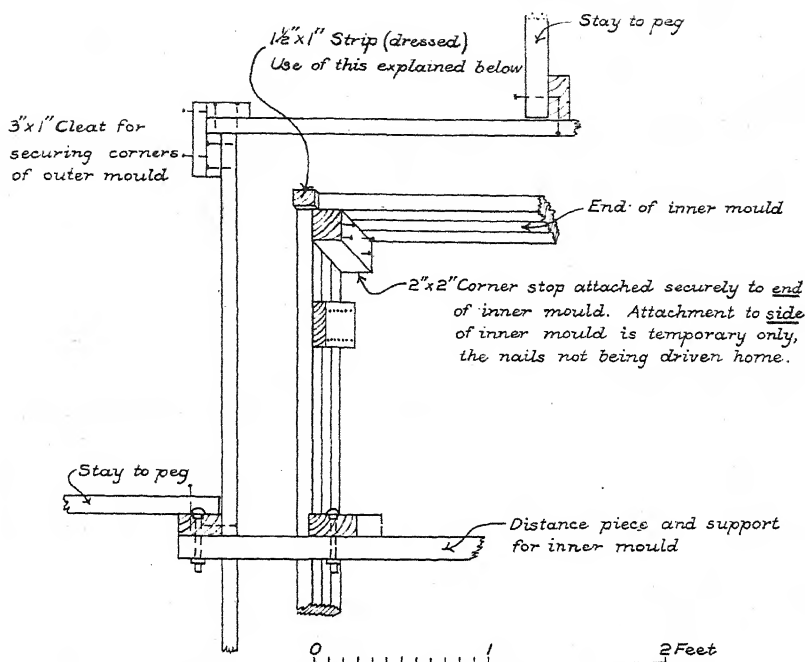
DETAILS OF CORNER OF ASSEMBLED MOULD OF WATER-TROUGH.
